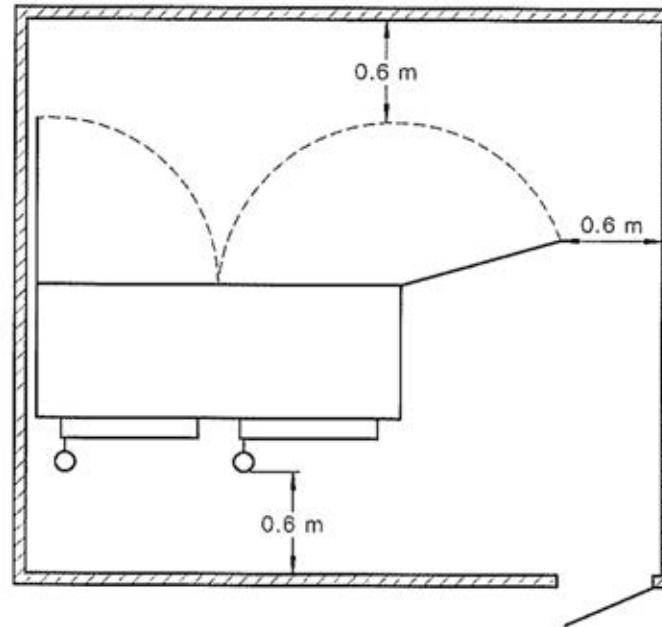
ACCESS TO SWITCHBOARDS—
